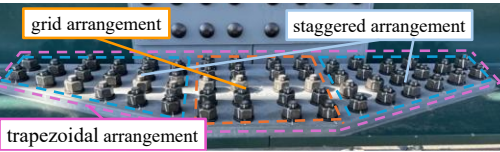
Friction-type bolted joints with trapezoidal arrangement
